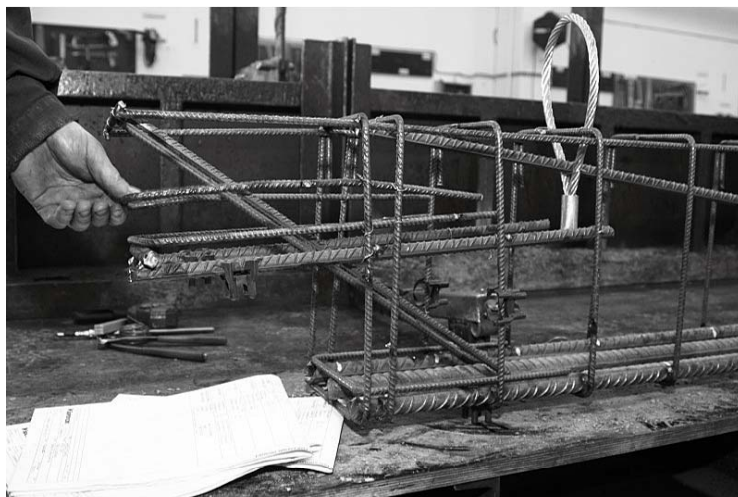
Reinforcement layout according to common practice in the Norwegian precast industry. The steel wire is a lifting hoop used when moving the specimens.
